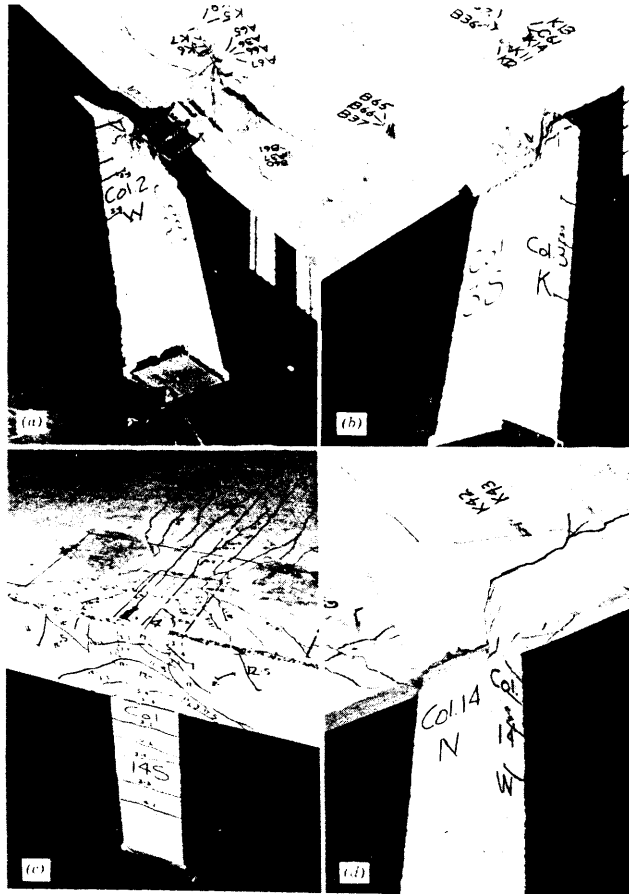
VIEWS OF BEAM-COLUMN CONNECTIONS
